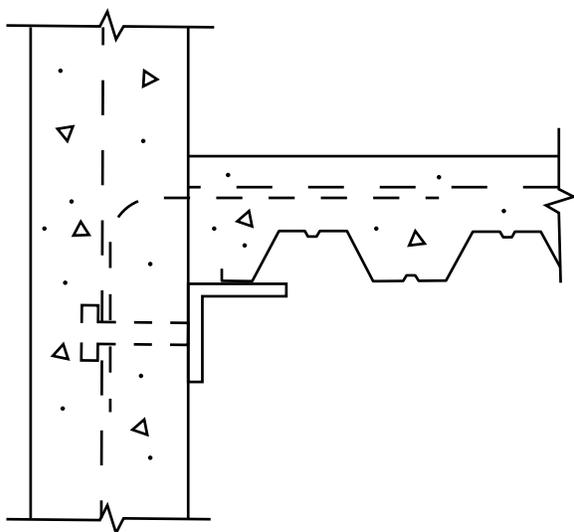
CONCRETE OR CMU WALL LEGER DECK PARALLEL
